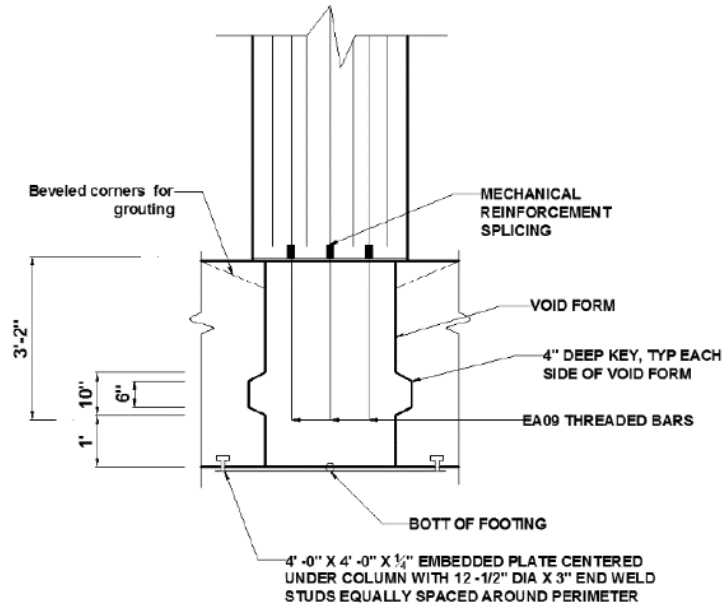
Precast column-footing connection with grouted void/pocket and shear key proposed by Aktan and Attanayake (2013)
